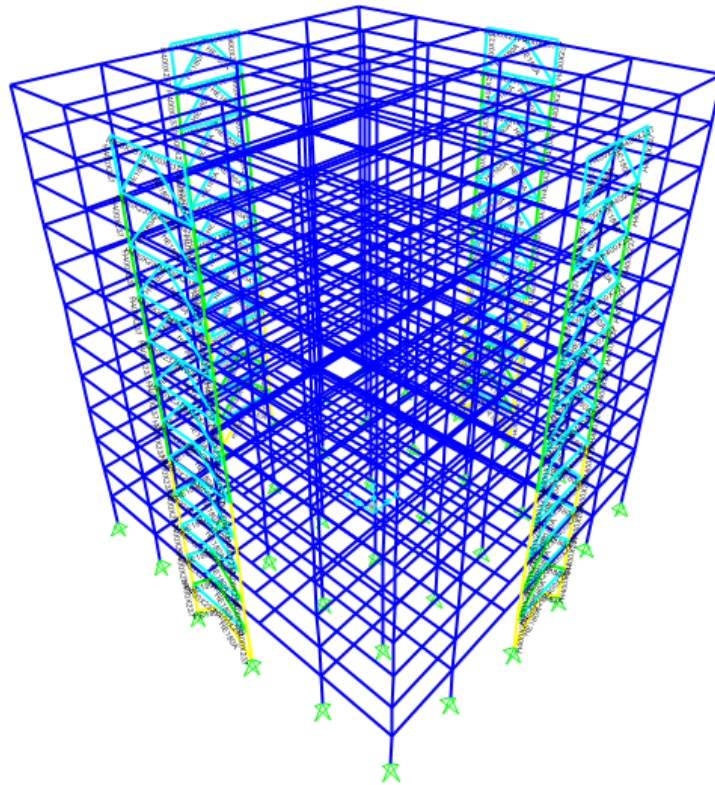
Design Results of Inverted V-Type Bracing System for 12-Story Strengthened Building Model
